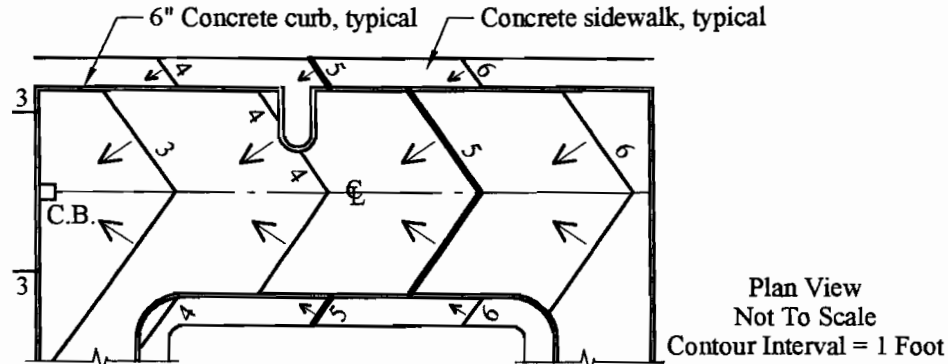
Parking Lot With End Catch Basin and Concrete Curbs and Sidewalks
